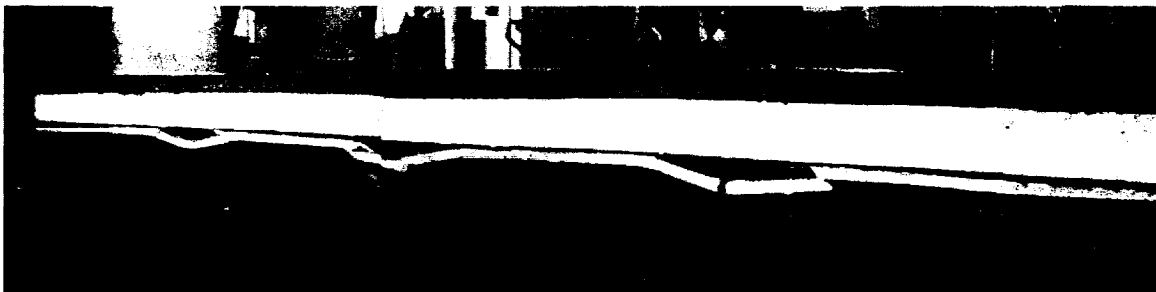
Warping deformation of steel deck and cracking of gypsum board – Test 45 (Yang, 2003)
